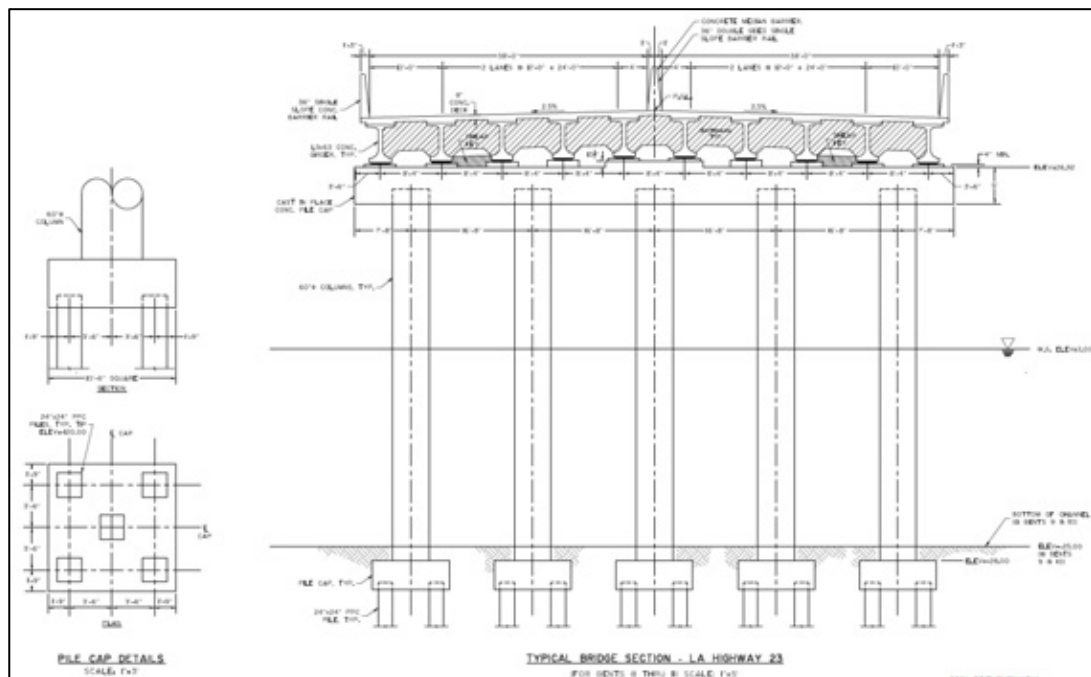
Figure V-II: Proposed Bridge Typical Section for Bents 8-11
